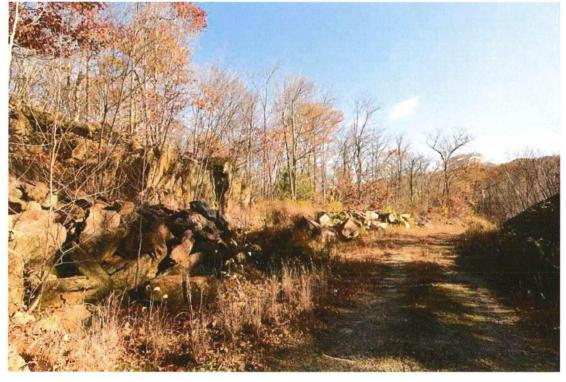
Access road, photo looking east toward Skinner St out of subject property, showing rock cut on the north side of access road exposed during previous construction activities.
